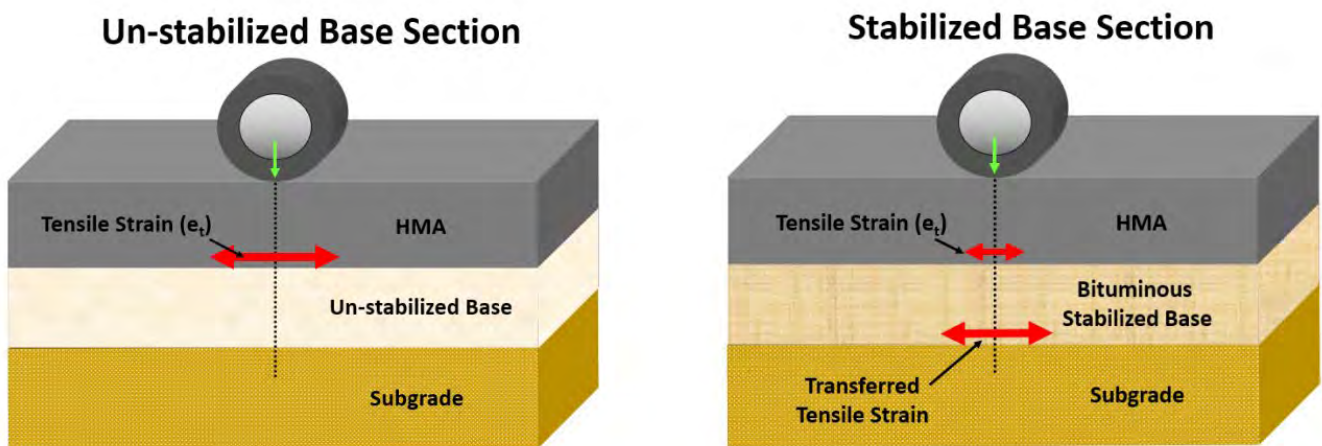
Horizontal tensile stresses in stabilized base vs un-stabilized pavement. Source: Wegman et al, 2017
